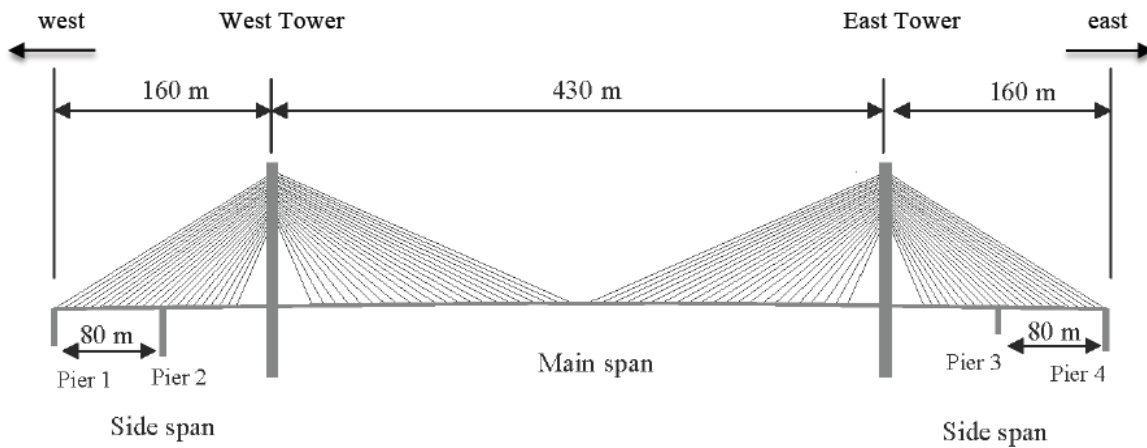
Kap Shui Mun Bridge (Naderian et al. 2014)
